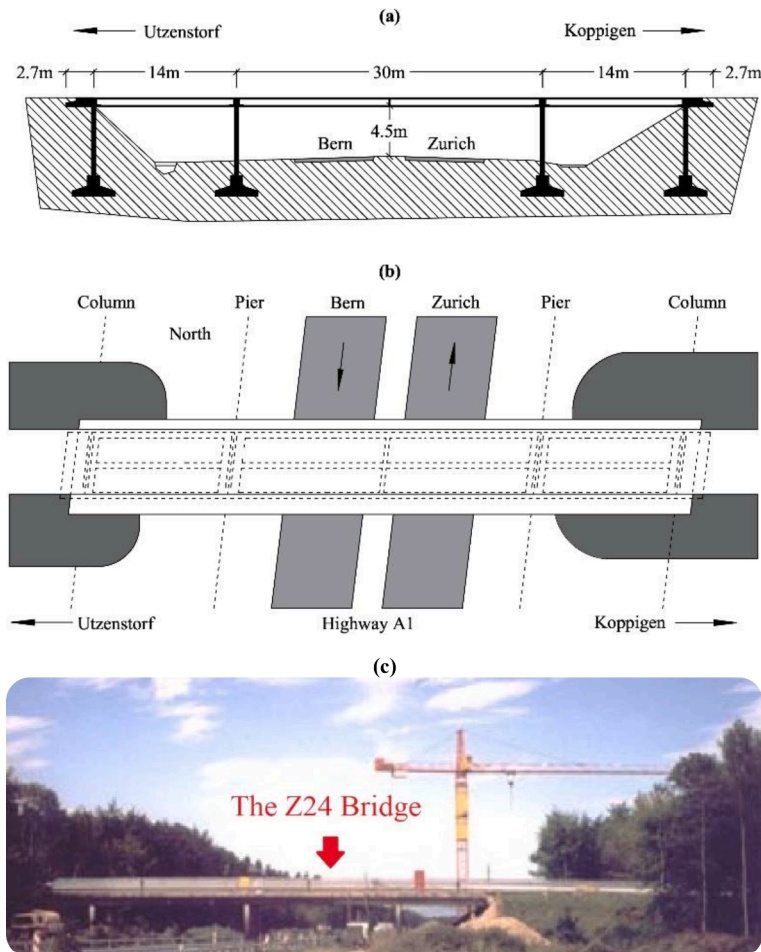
Z24 Bridge: (a) Elevation view and main dimensions, (b) plan view, and (c) an old picture of the structure.
